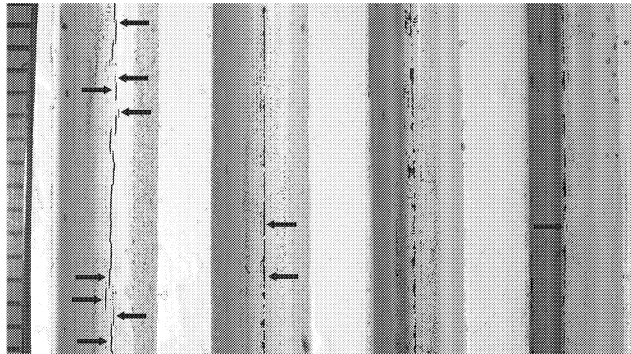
Crack pattern at 30 000 cycles. Arrow indicating new cracks or crack growth.
